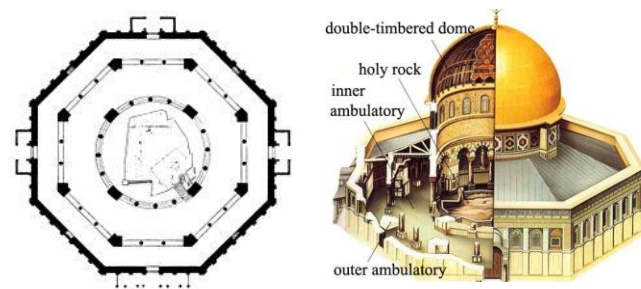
The floor plan and the section of Al Sakhra Dome Mosque [11].
